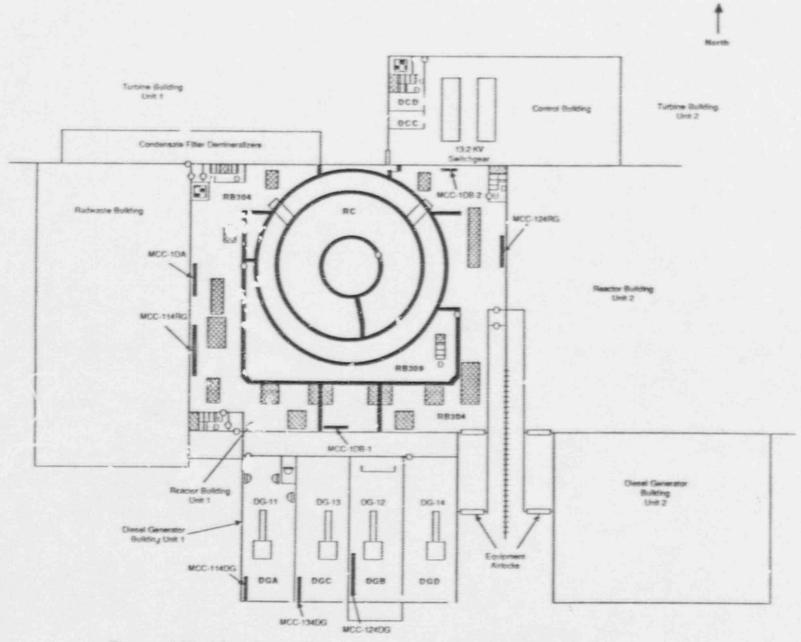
Limerick I General Arrangement, Elevation 217'
